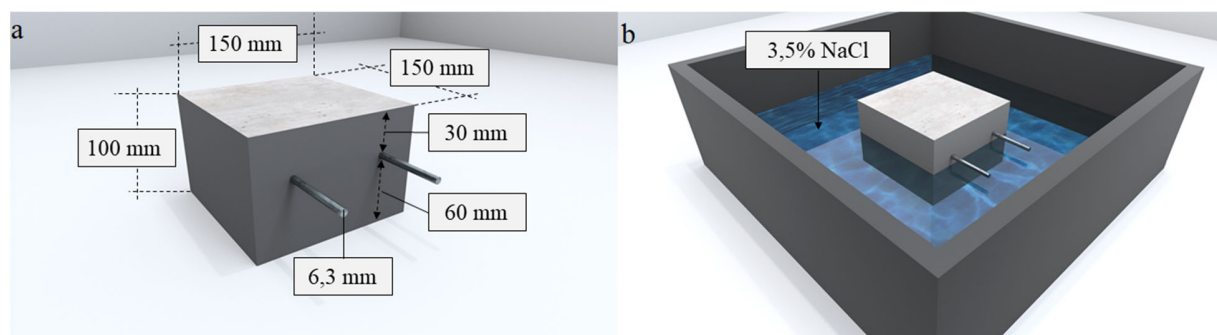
(a) Configuration of the reinforced prismatic concrete specimen. (b) Partially immersed specimen.
